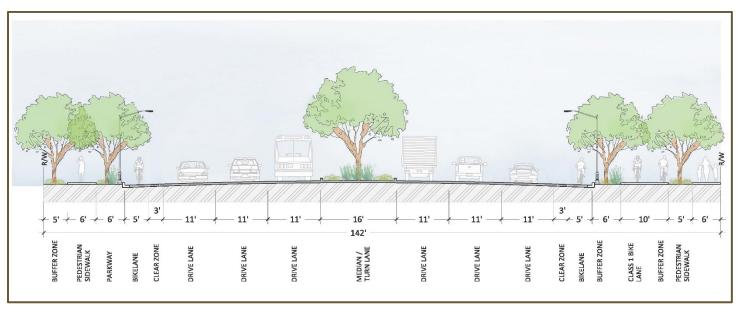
Airway Road Streetscape- 6-Lane Primary Arterial
